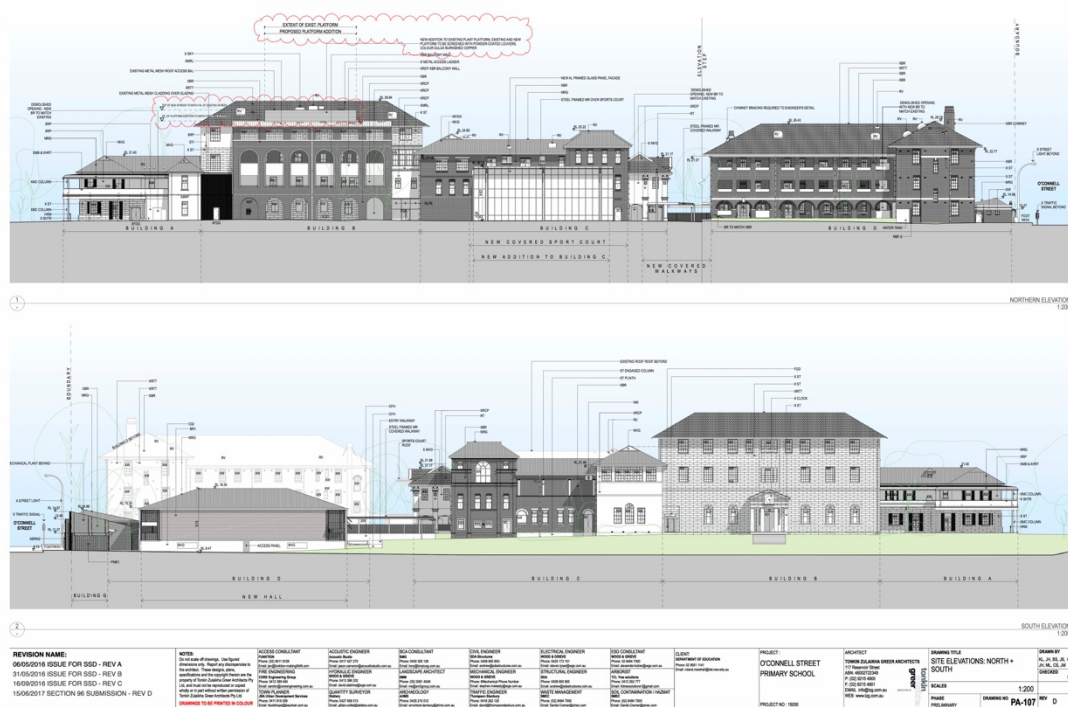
North Elevation showing the Proposed location for the extension of the Plant Platform.
